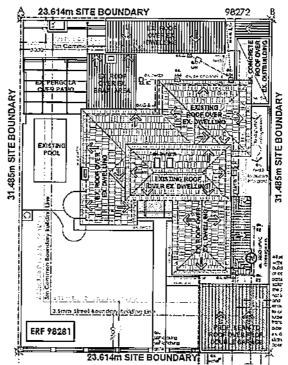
The proposed double garage is shown in red hatching in the above extract from the building plan
